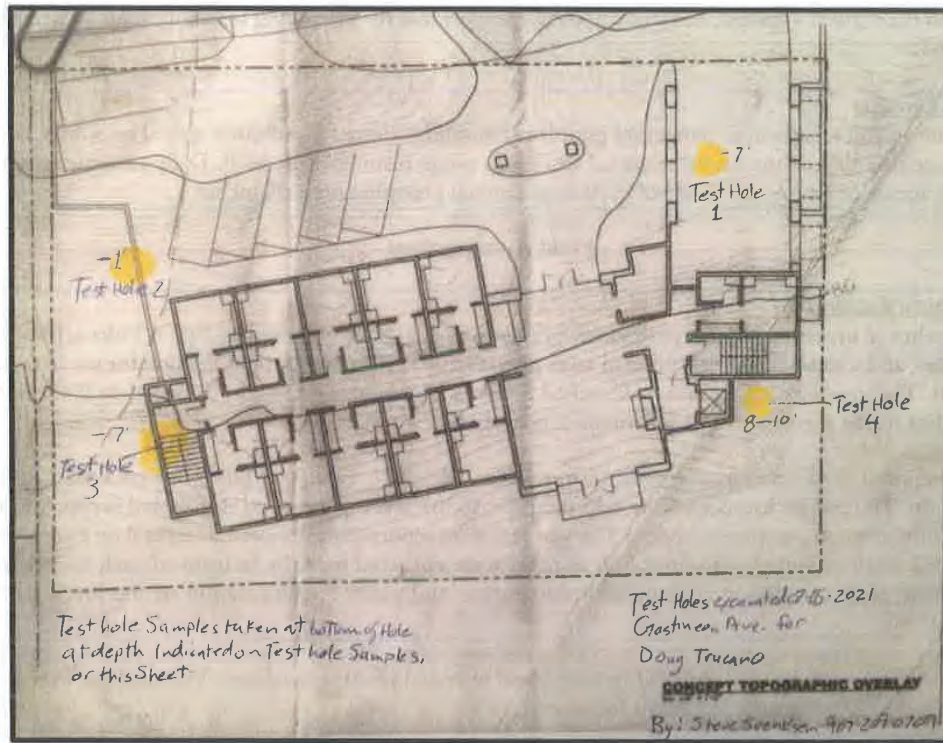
Test Pit Map with Site Plan and Topographic Overlay
